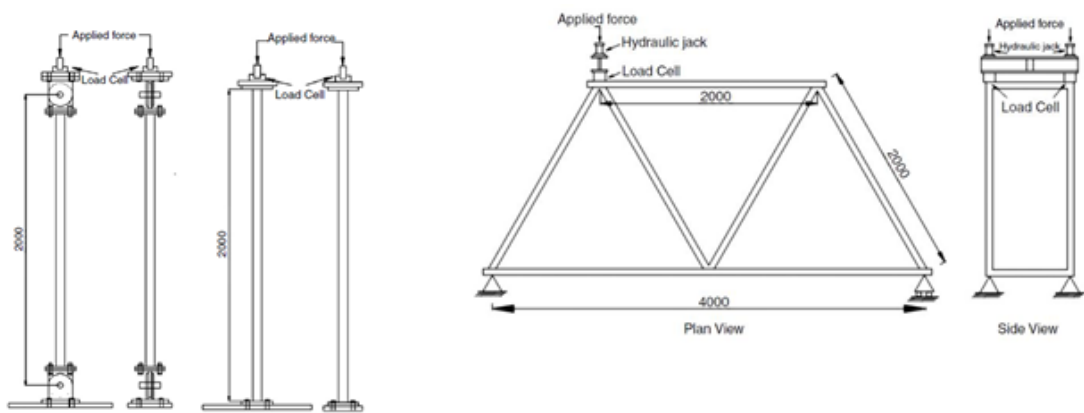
Side view and end condition details of the truss (Fong et. al, 2011)
